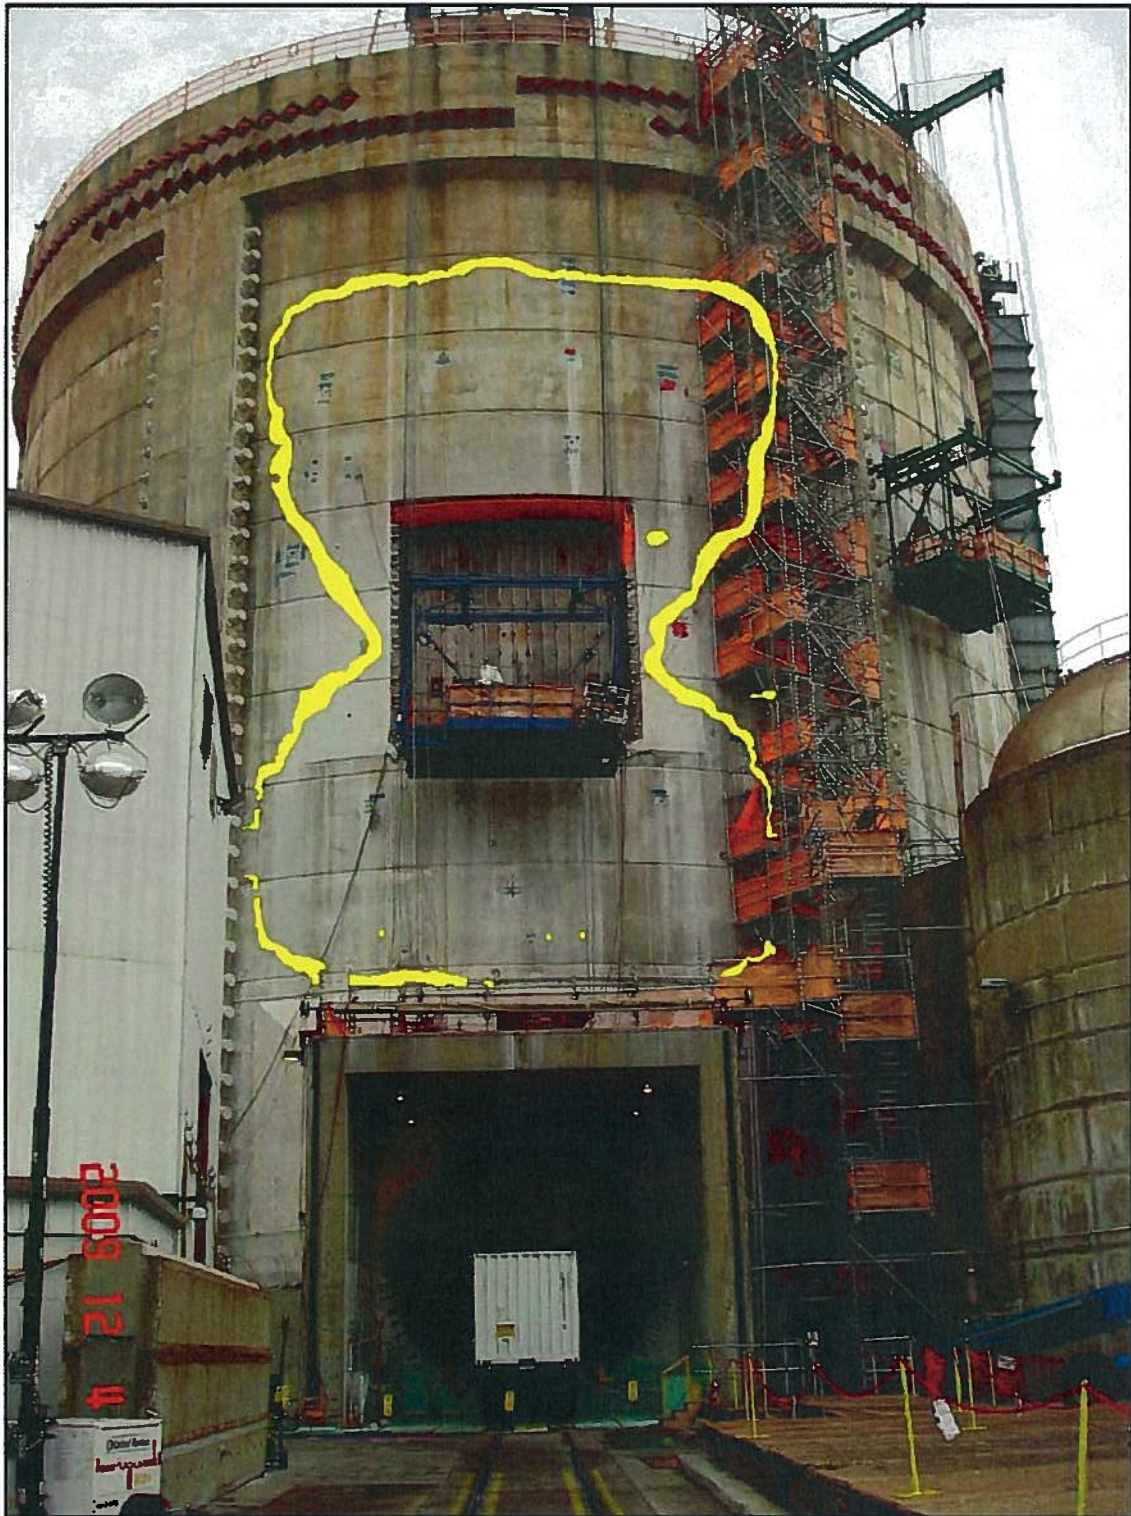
Delamination zone outline overlaid on the containment wall above and below the SGR opening
